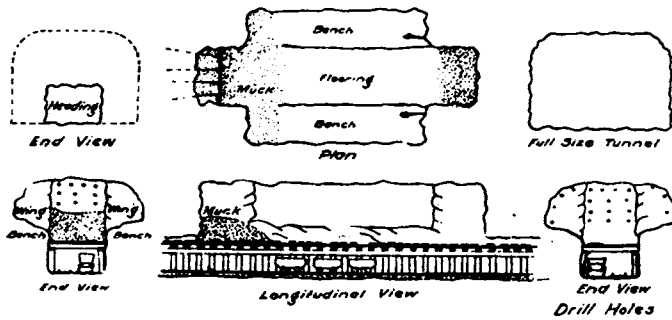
Details of Construction, Mt. Royal Tunnel, Canadian Northern Ry.
